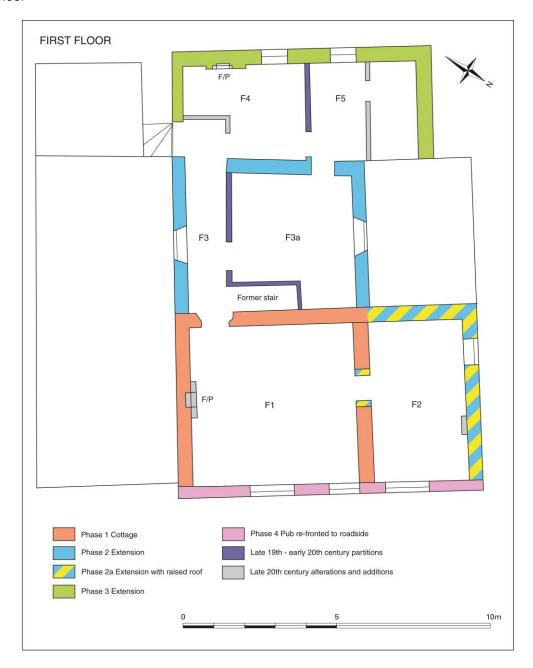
The former Monk and Minstrel, first floor plan, phased (Andy Isham).
